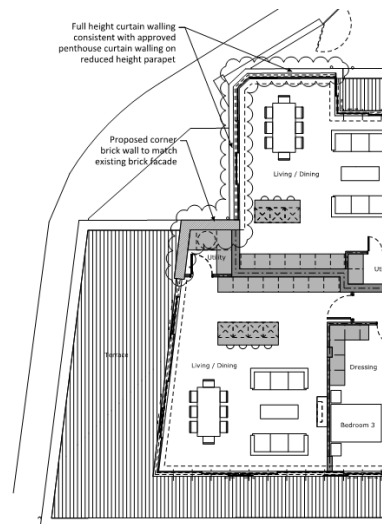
(above): Upper floor flat at Linton House adjacent to proposal
